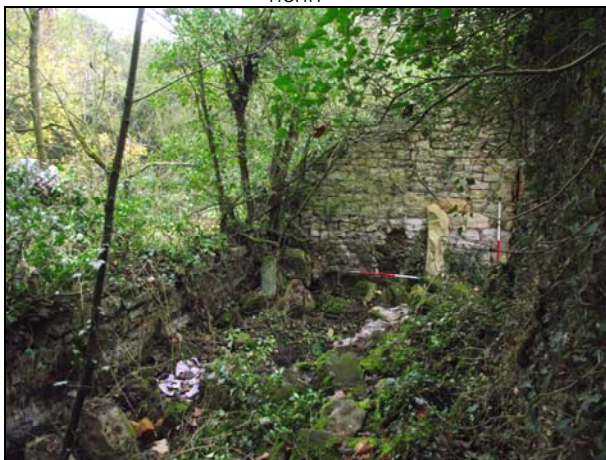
, 12: View of the northwest wall, northwest elevation with the blocked arched alcoves [35], from the north
